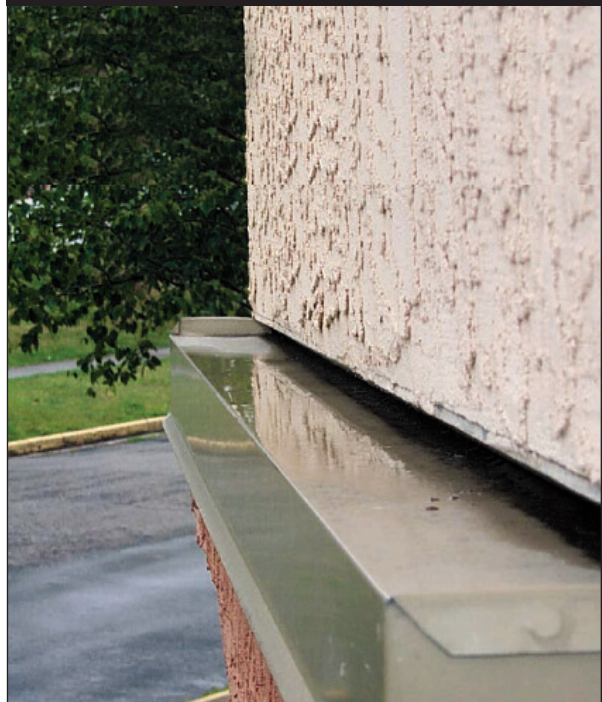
Windowsill detail at stucco interface; no sill flashing to direct water away from window to stucco interface and no sealant at window perimeter creates potential water ingress point
